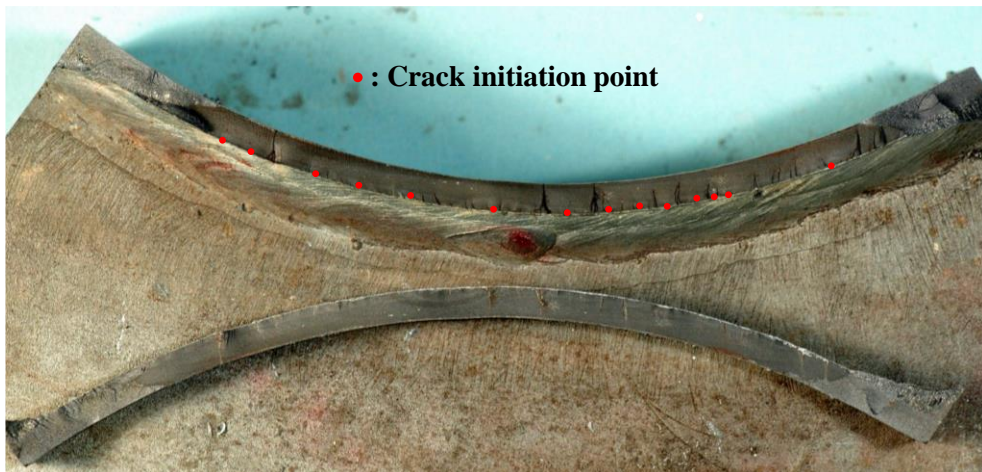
Fatigue fracture surface and identified crack initiation points in Type I-7 Pole
